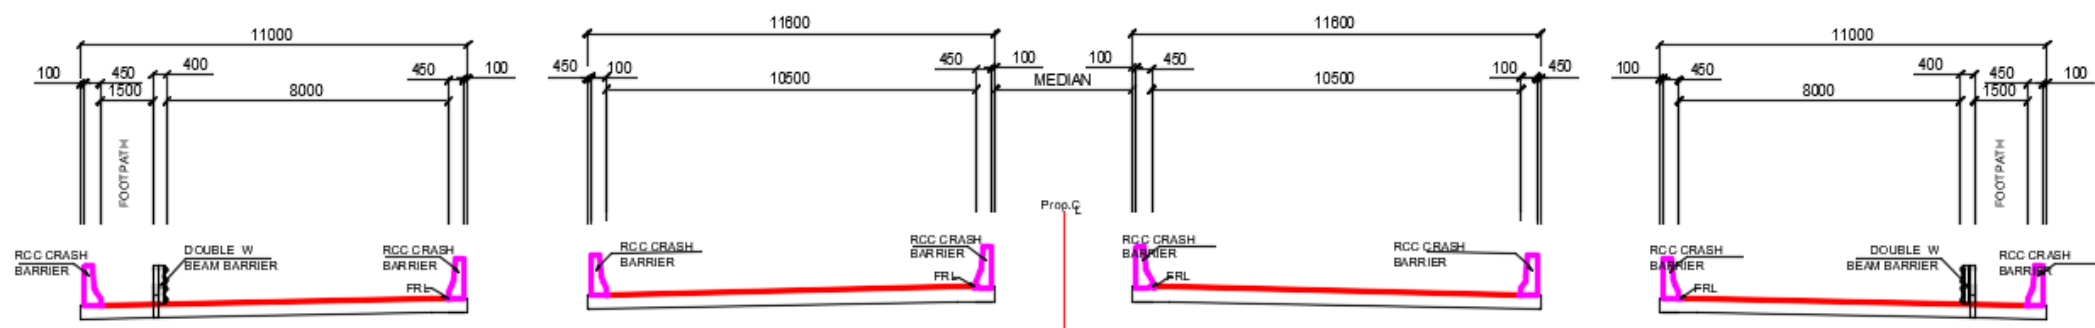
4-Lane Bridge at Deck Level with Service Road and Footpath (TCS-17)
